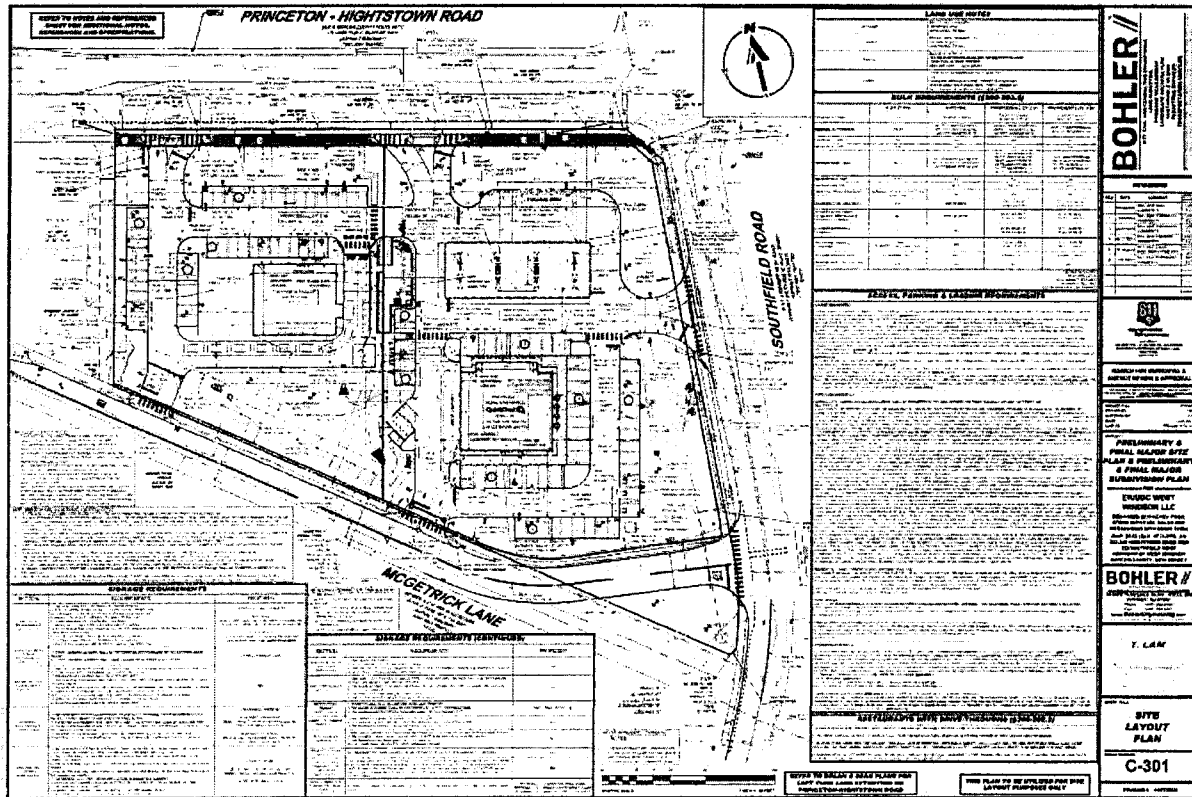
McGetrick Lane Layout Plan by Bohler Engineering, NJ, LLC
